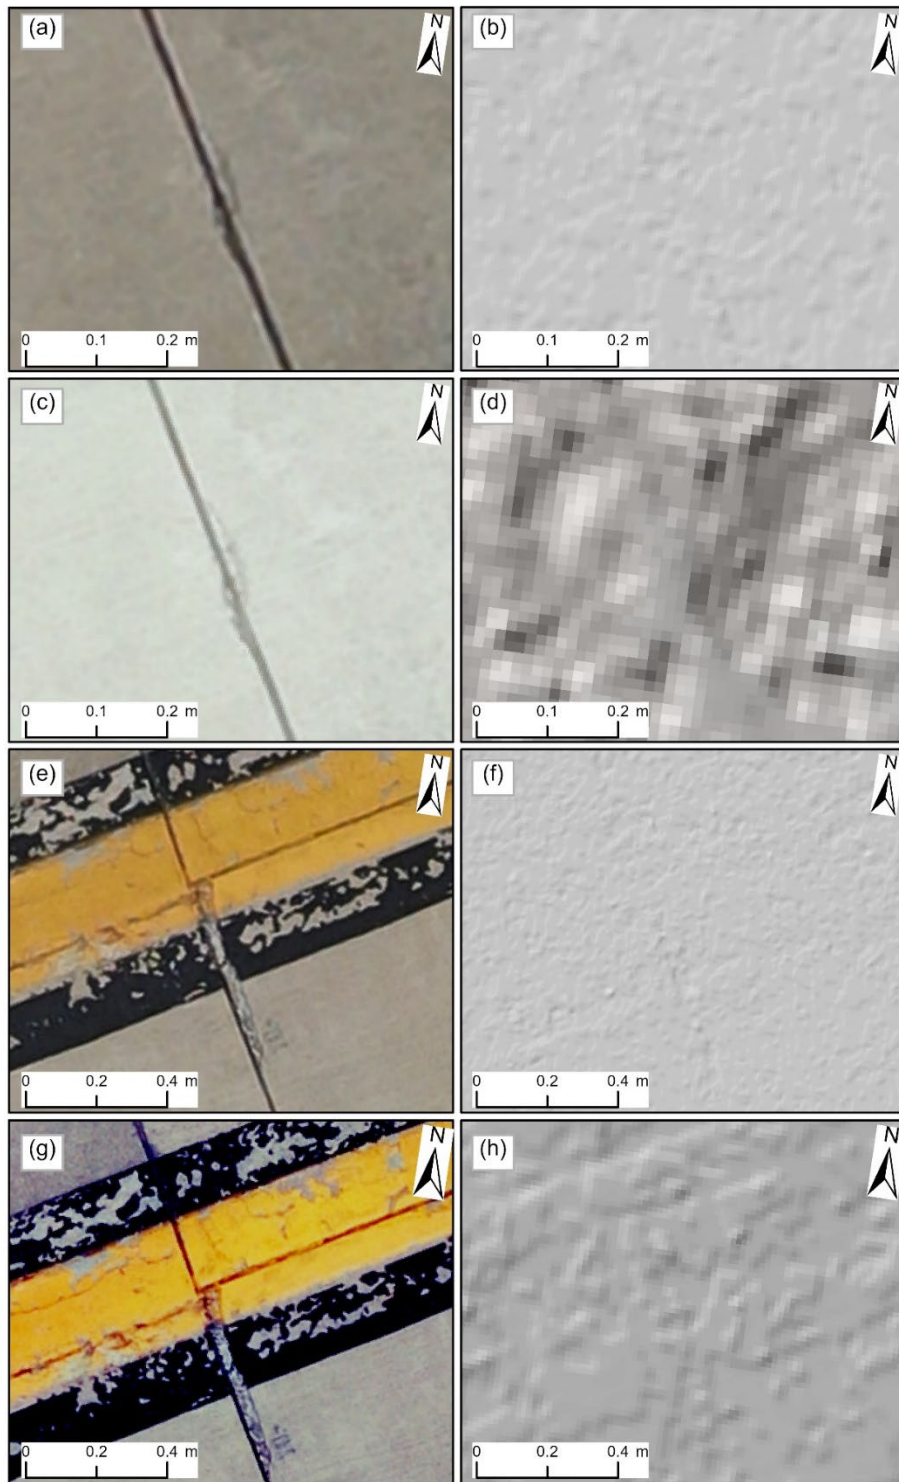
Joint Spalling (L) in (a) 2.5-mm/pix Orthophoto, (b) 5-mm/pix DEM, (c) 3.6-mm/pix Orthophoto, and (d) 14.3-mm/pix DEM; and Joint Spalling (M) in (e) 2.5-mm/pix Orthophoto, (f) 5-mm/pix DEM, (g) 2.5-mm/pix Orthophoto, and (h) 5-mm/pix DEM Derived
